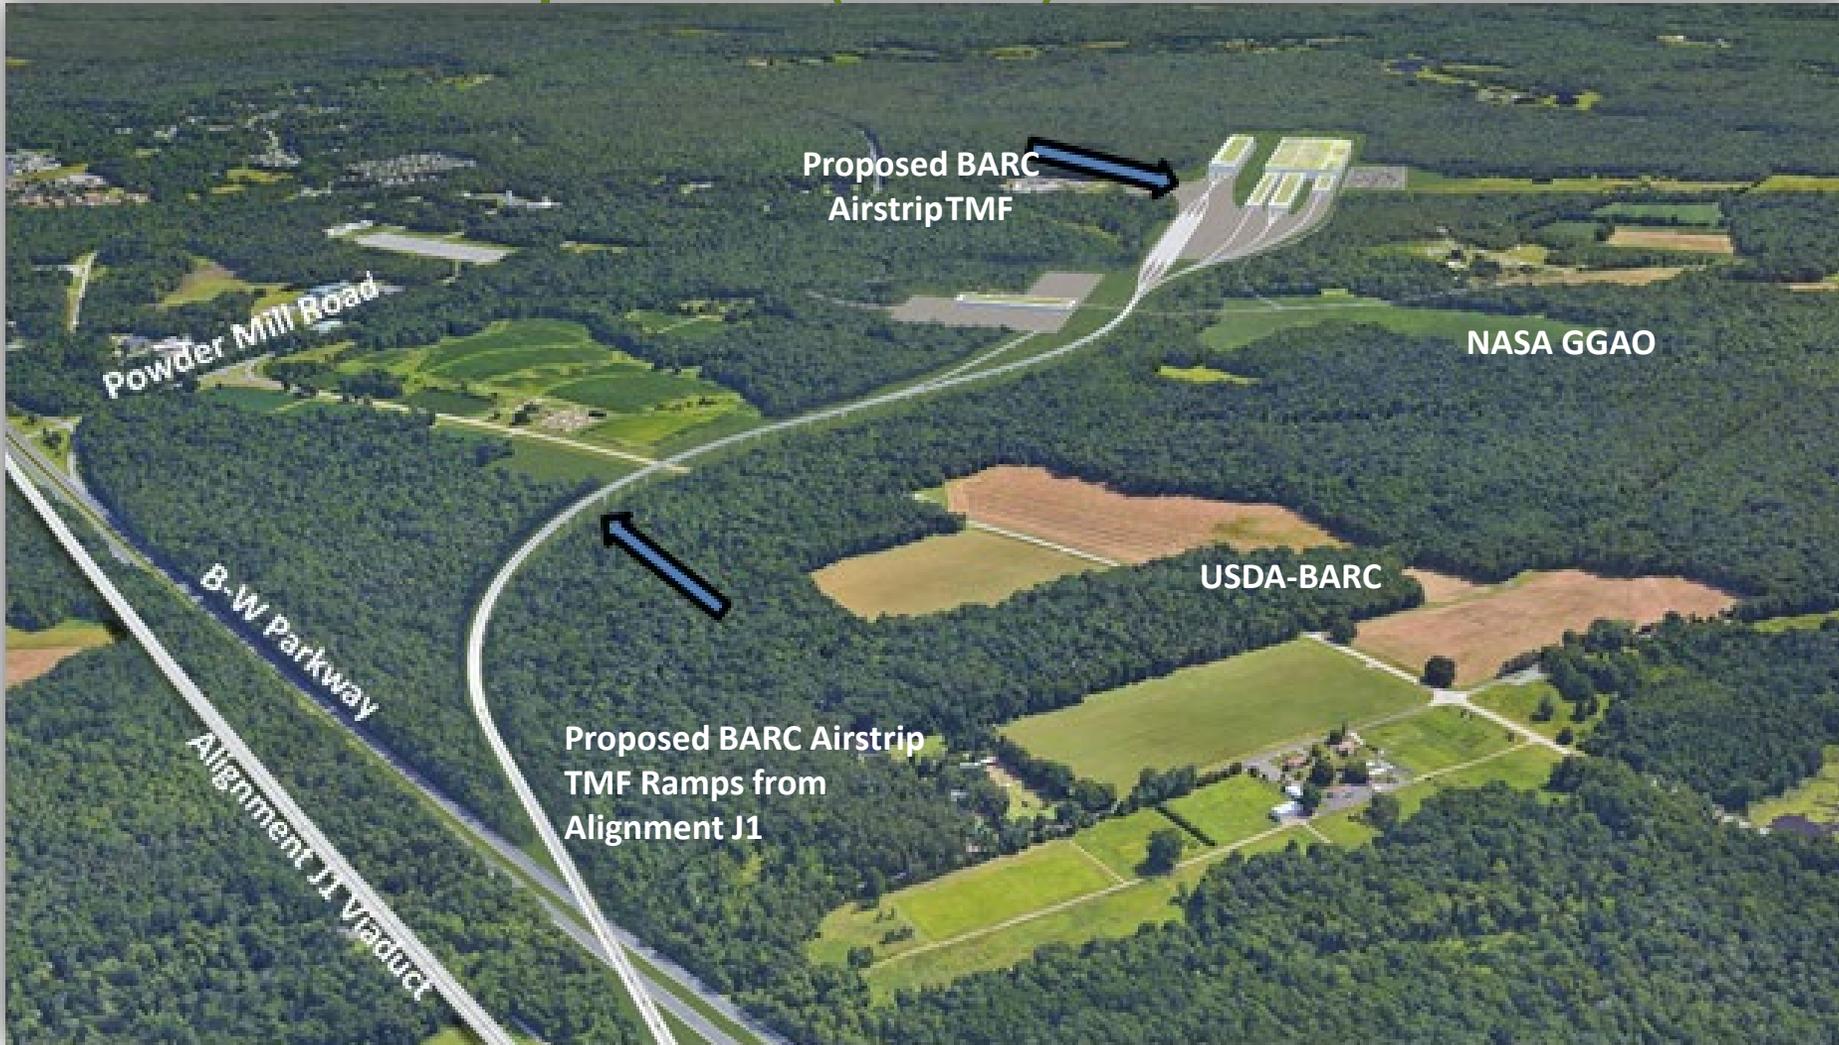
CAAs #5 and #6 - Illustrative Rendering of Proposed BARC Airstrip TMF and Corresponding Ramps with Alignment J1, Looking East
